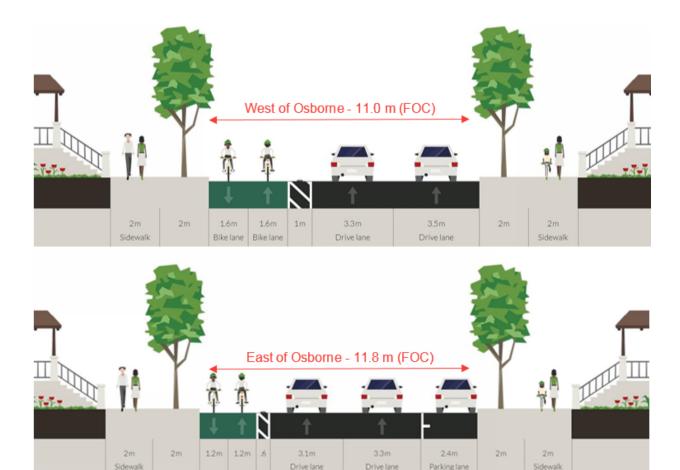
Two-Way Bicycle Lane on Stradbrook Avenue on North Side with no Parking West of Osborne Street
